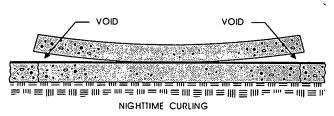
Development of void under unbonded concrete pavements from the differential curling phenomenon, Voigt et al. (63).
